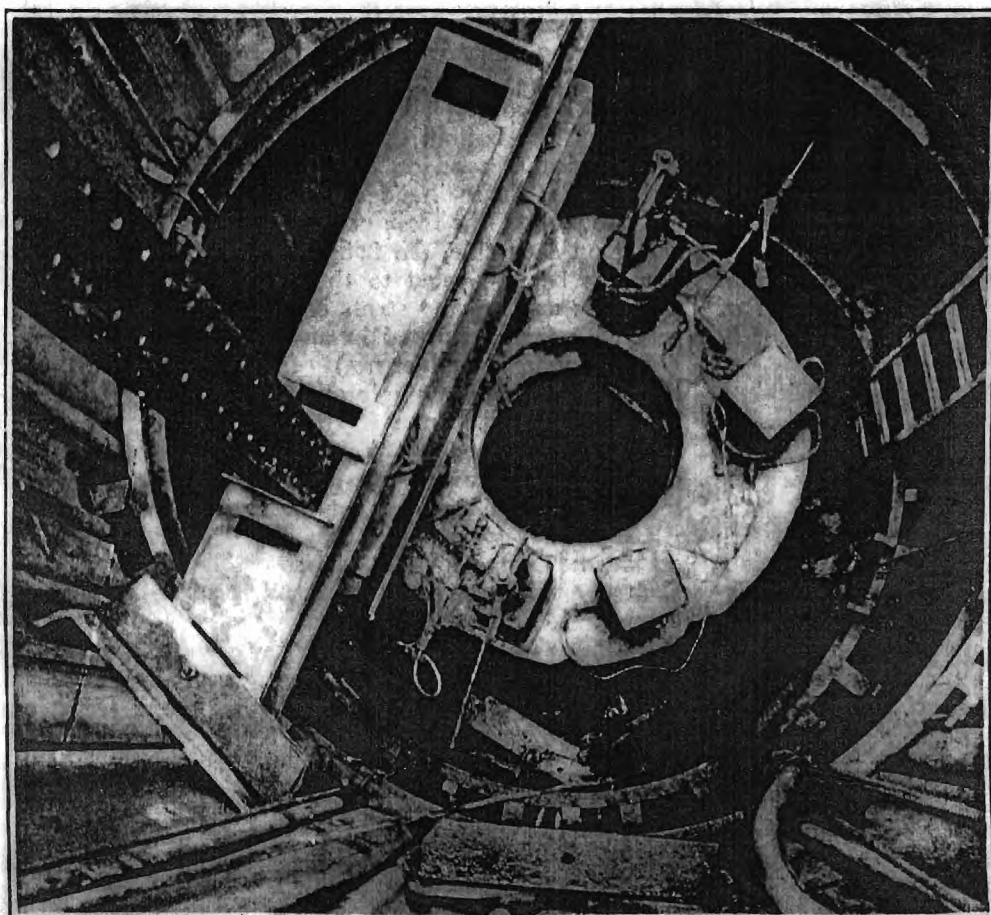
FOUNDATION SHAFT WITH JACKING RIG
